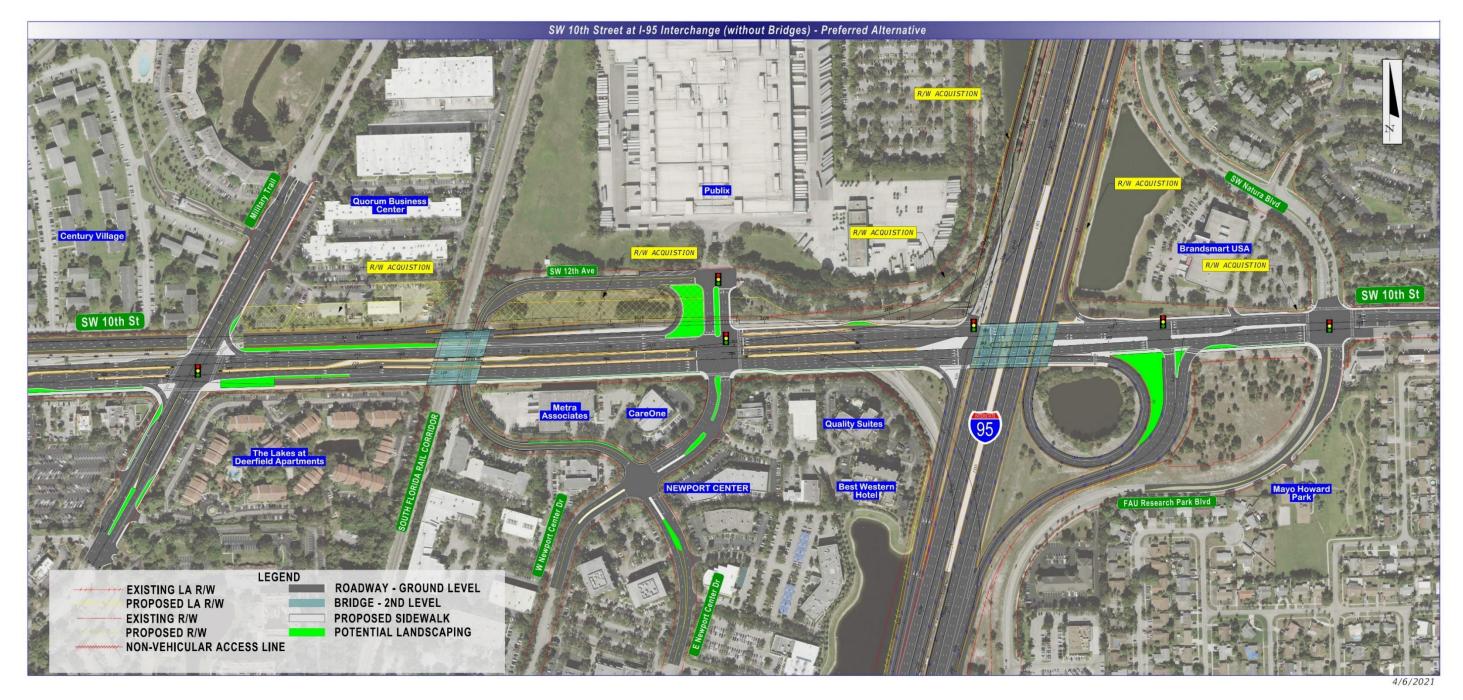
SW 10th Street – North Alignment Concept Plan (2 of 2)
